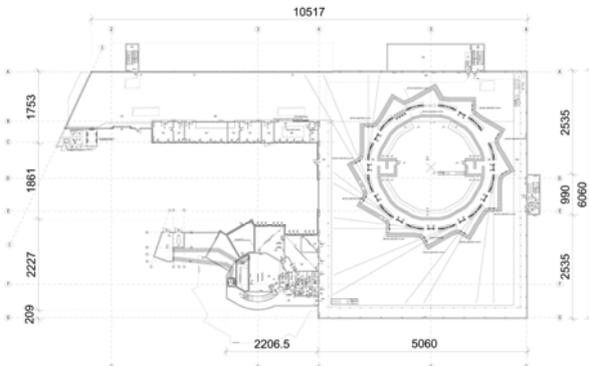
Concept of the facility layout on level -3.2 m. The experimental hall can be extended by about 10 m on the right hand side in the future. Above the linac tunnel ample covered space is available for pre-assembly and general laboratories. Dimensions in centimetres.
